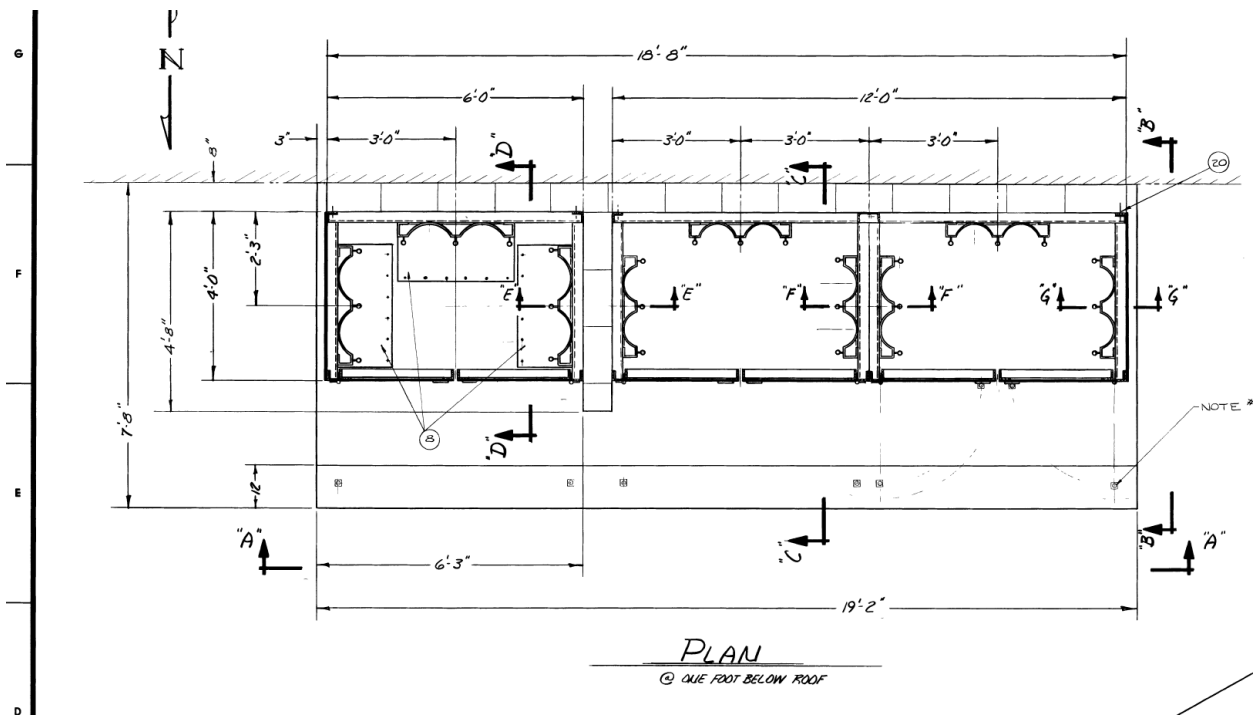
2734ZK Gas Bottle Storage Building, Top View
